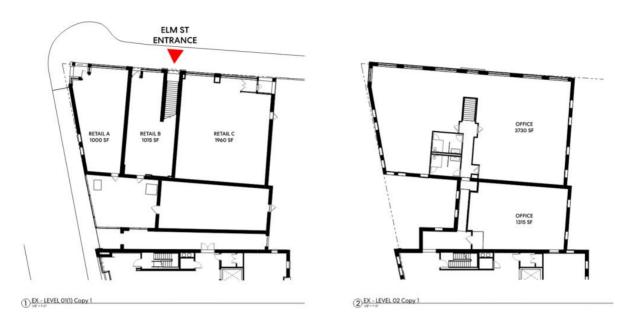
Elm Street Interior Stair and Tenant Retail Space Configuration
